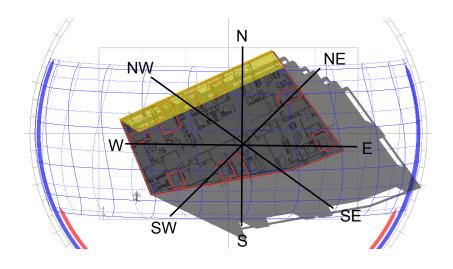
iTypical floor plan Solar penetration on 21 June
